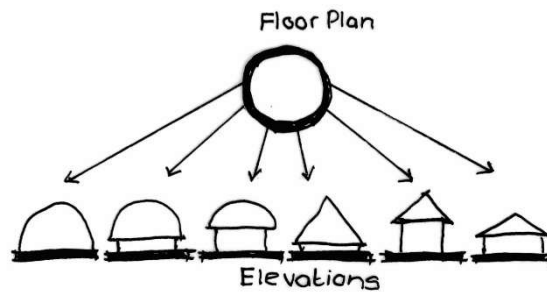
Possible elevational projection from a typical circular plan of a hut
